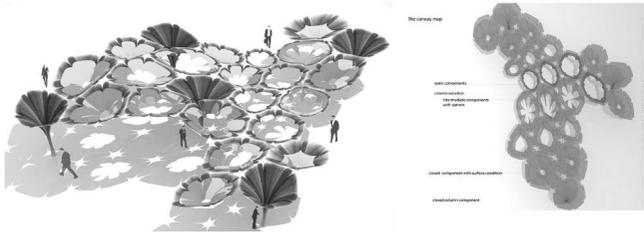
Site plan & site elevation of the canopy model, clearly showing the complex double curve profile of the base surface
